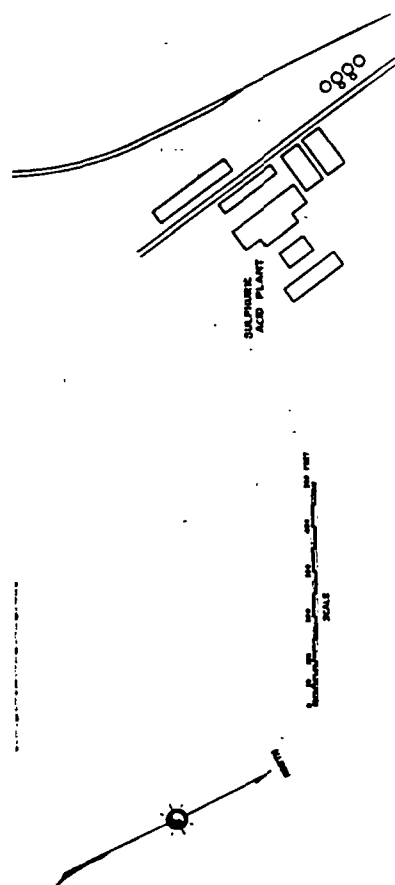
GENERAL PLAN OF 30,000-METRIC-TON PANDA LEACHING PLANT.
